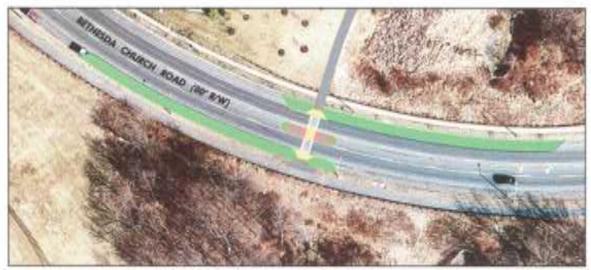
Proposed at-grade mid-block crossing of Bethesda Church Road with curb bump-outs and a median refuge island. The curb bump-outs will extend for 250 feet in both directions to ensure parked cars can not encroach on sight distance.
